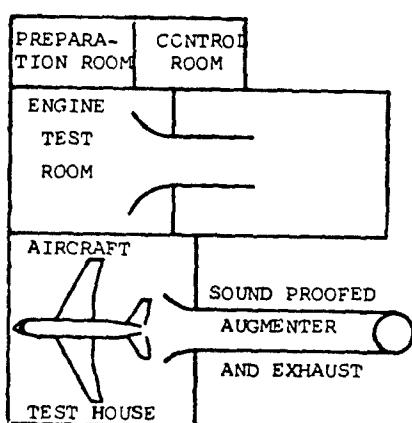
LAY-OUTS OF THE TEST- BUILDINGS
